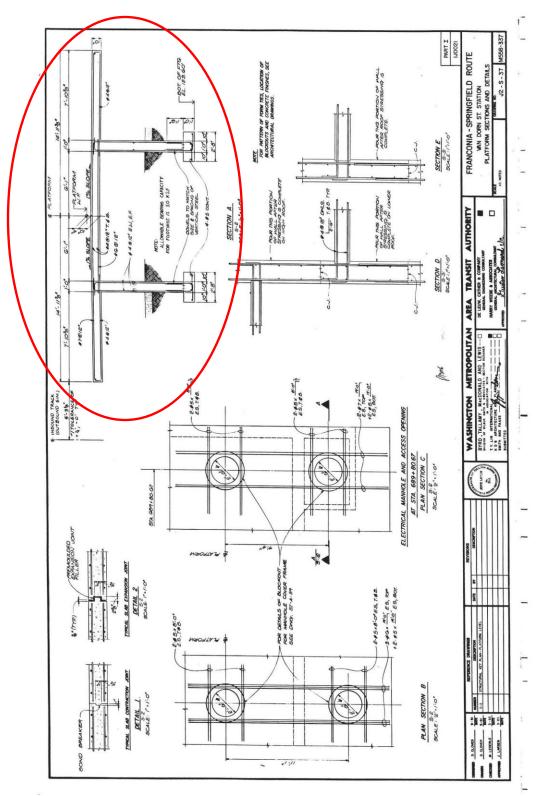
Section A shows reinforcing details which reflects redundant existing longitudinal rebars in Figure 2. Refer to Figure 7 for the location.
